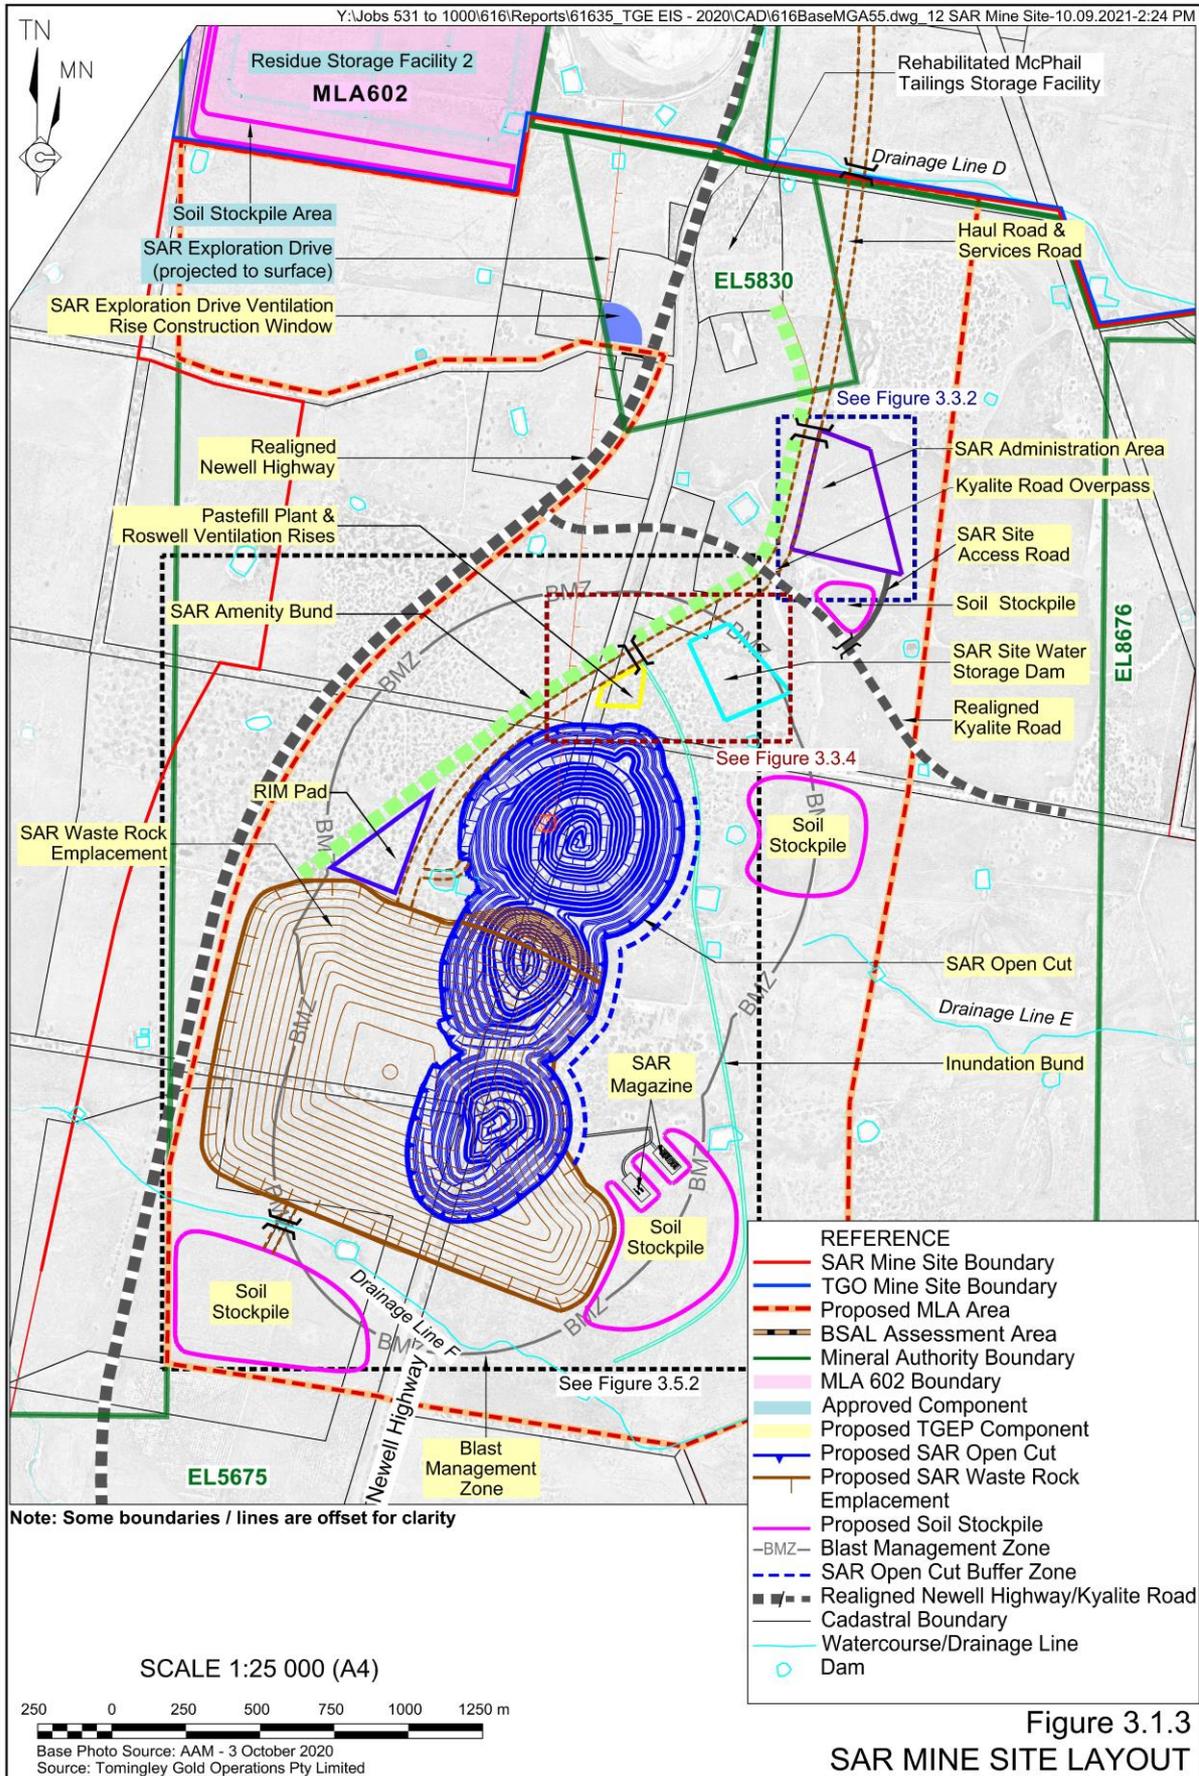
Project Site layout (Source: RW Corkery & Co, 2021)
